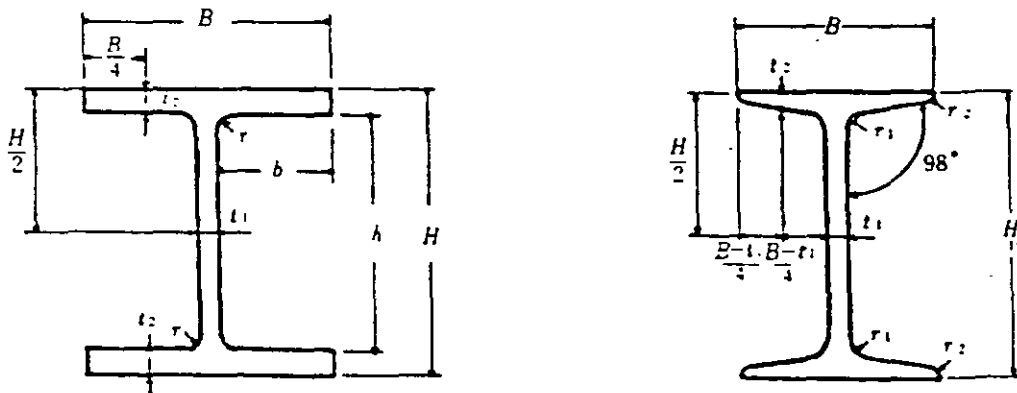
Cross sections of wide-flange beam and I-beam
